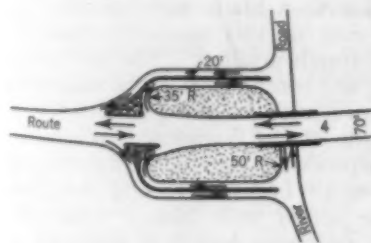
SEPARATION AT RIVER ROAD, TEANECK, N.J., UTILIZES COMMON ROADWAY FOR CONNECTING RAMPS
